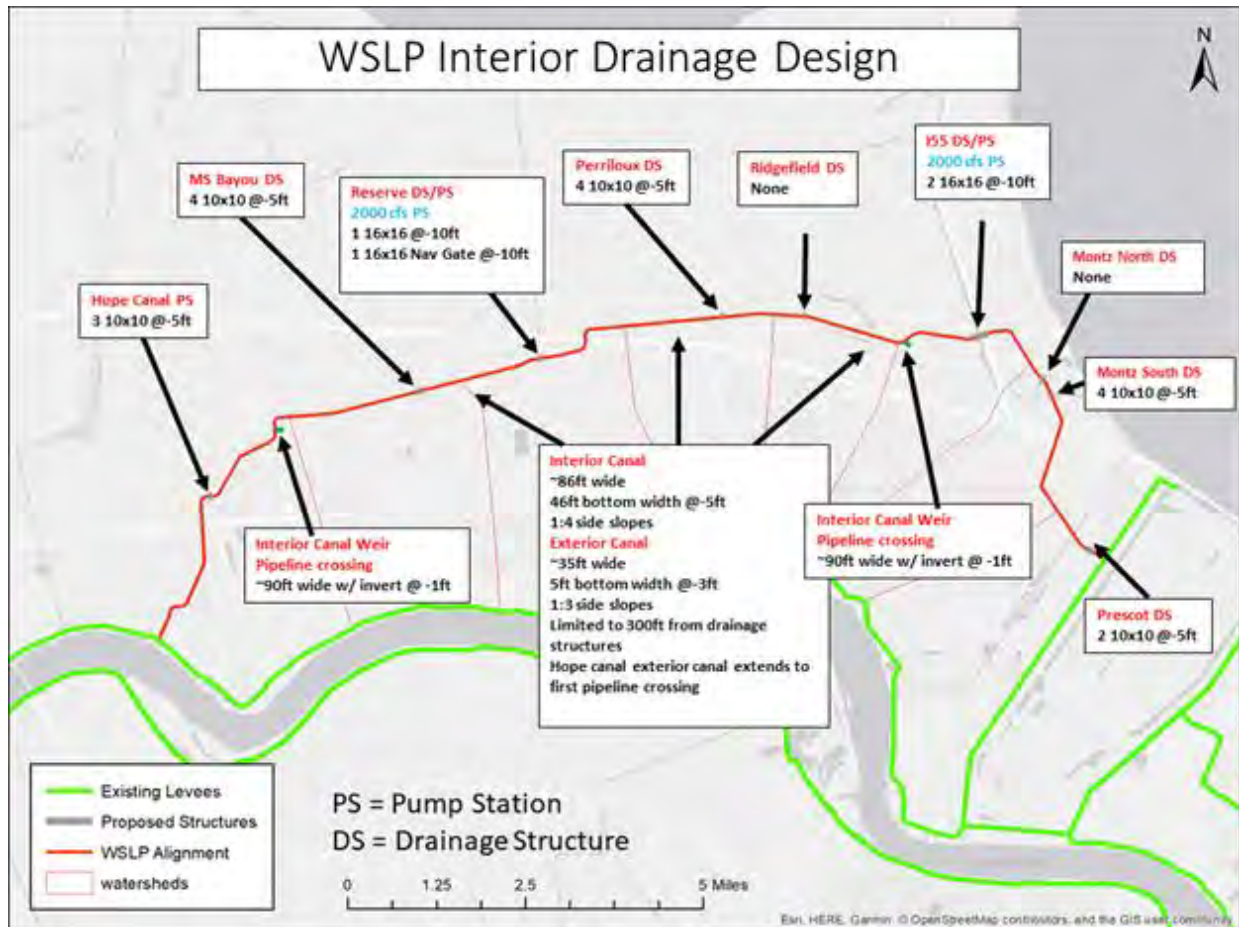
Structures for the final WSLP Interior Drainage Design.
